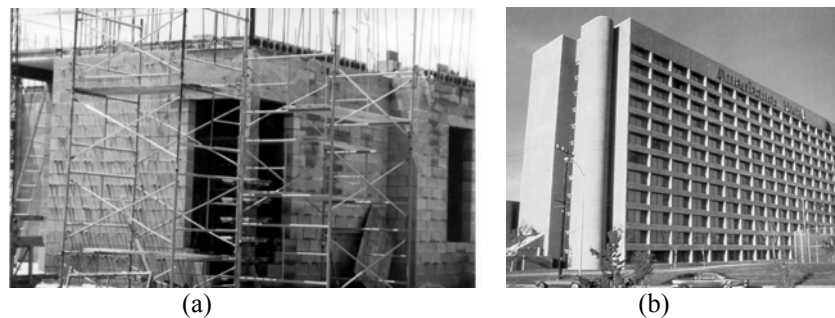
In USA grouted structural masonry walls are common: (a) four-story building with reinforced concrete blocks masonry and prefabricated slab panels, and (b) twelve-story hotel with reinforced masonry: double leaf with external ceramic bricks.
